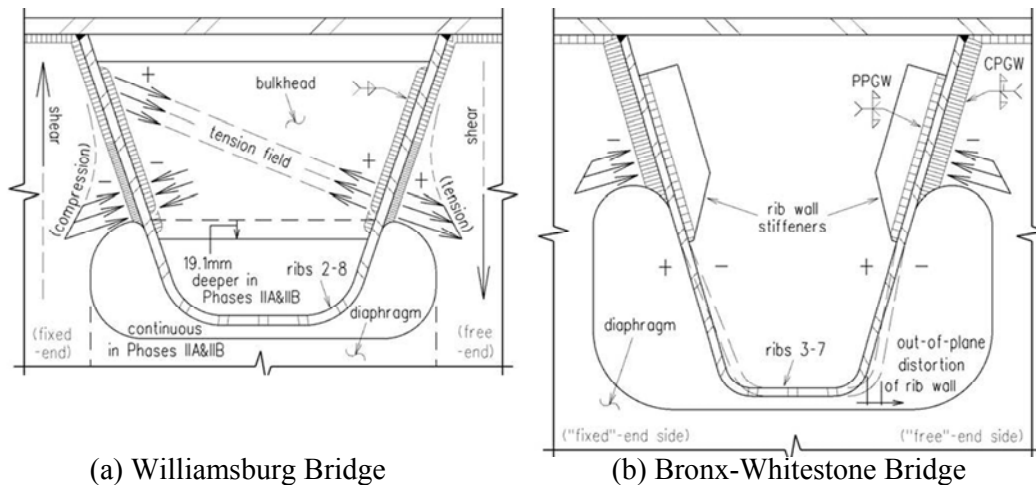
Cross Sections and Schema of Stress Field at Rib to Floor Beam Connection in as-built Orthotropic Decks
